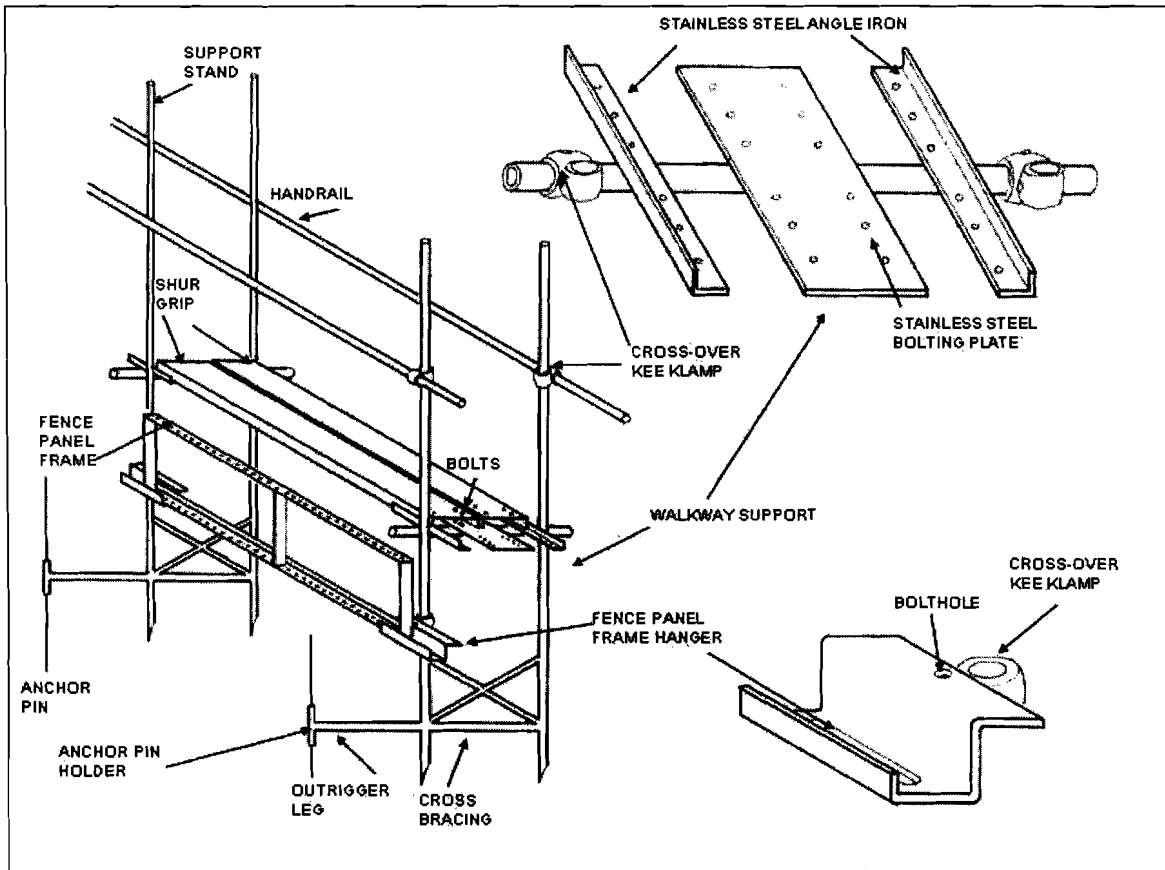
Schematic of one 3.7 m length of sectional fish deflection weir. The enlarged view top right shows detail of the walkway support. The enlarged view bottom right shows fence panel frame hanger.
